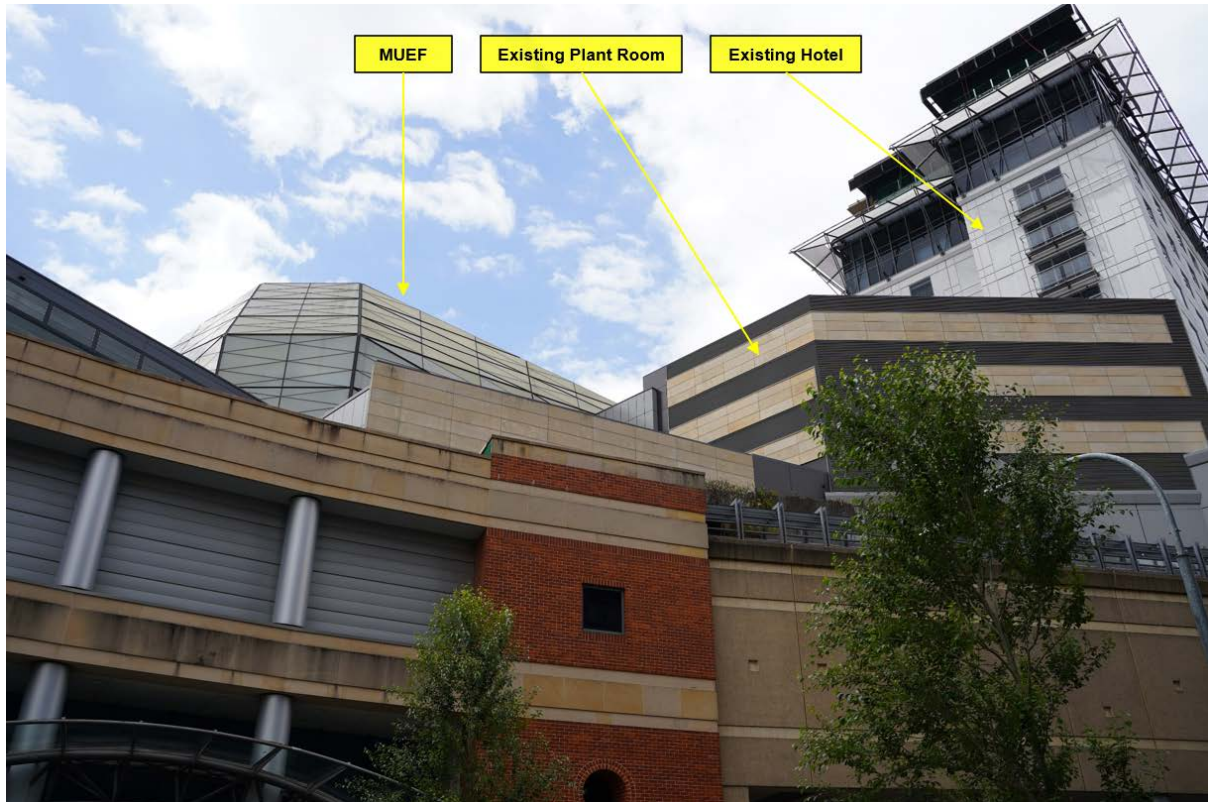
| Existing view of the MUEF and existing plant room from Jones Bay Road (Source: DPE)
